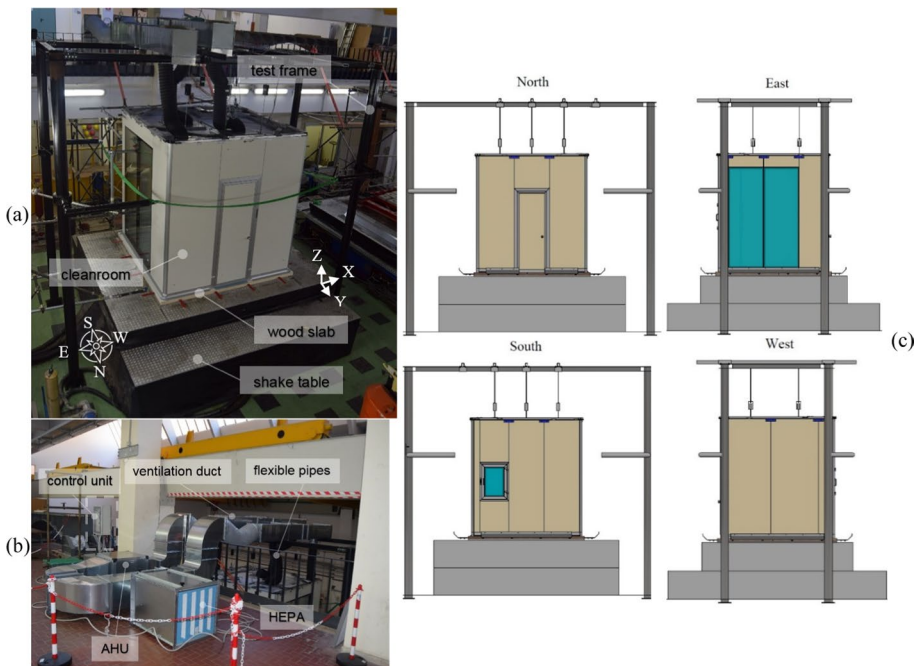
Testing setup: a global view, b perspective views, and c centralized heating, ventilation, and air conditioning (HVAC) filtration system and control unit
